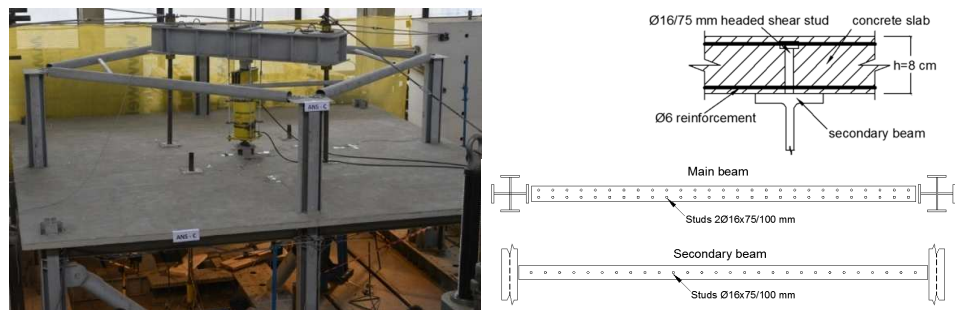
Views of specimen, test setup, and instrumentation [43]
